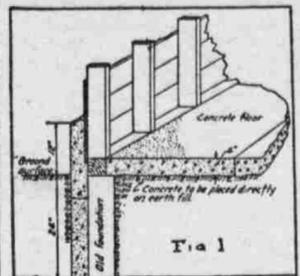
How an Old Foundation May Be Ratproofed and a Concrete Floor Installed.
